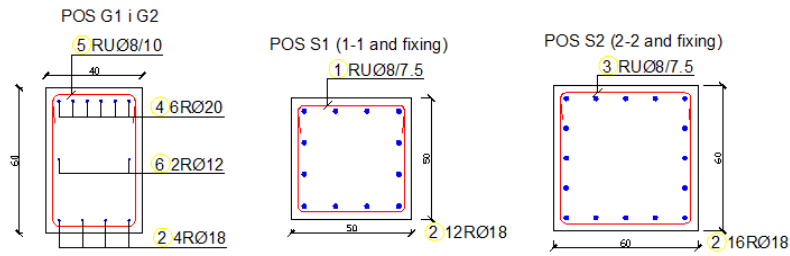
Adopted reinforcement of beams and columns in considered cross-sections
